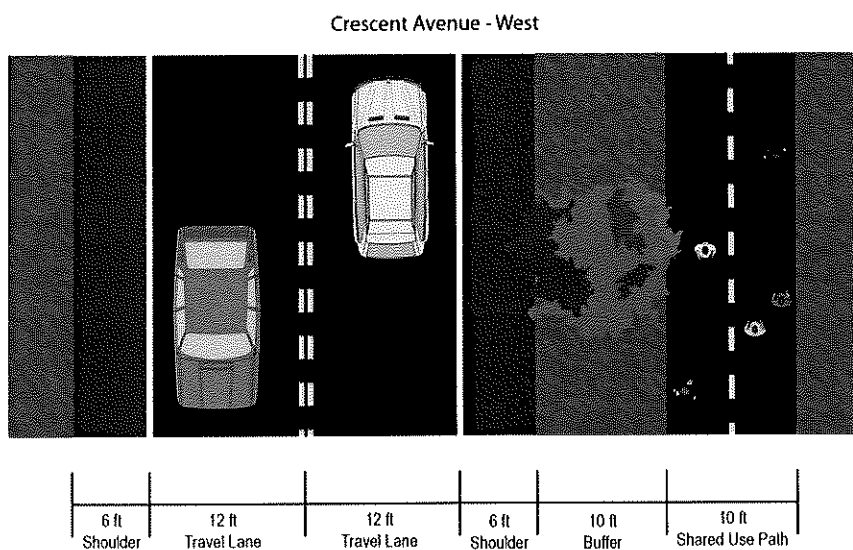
Crescent Avenue Cross-Section – Planned Improvements
